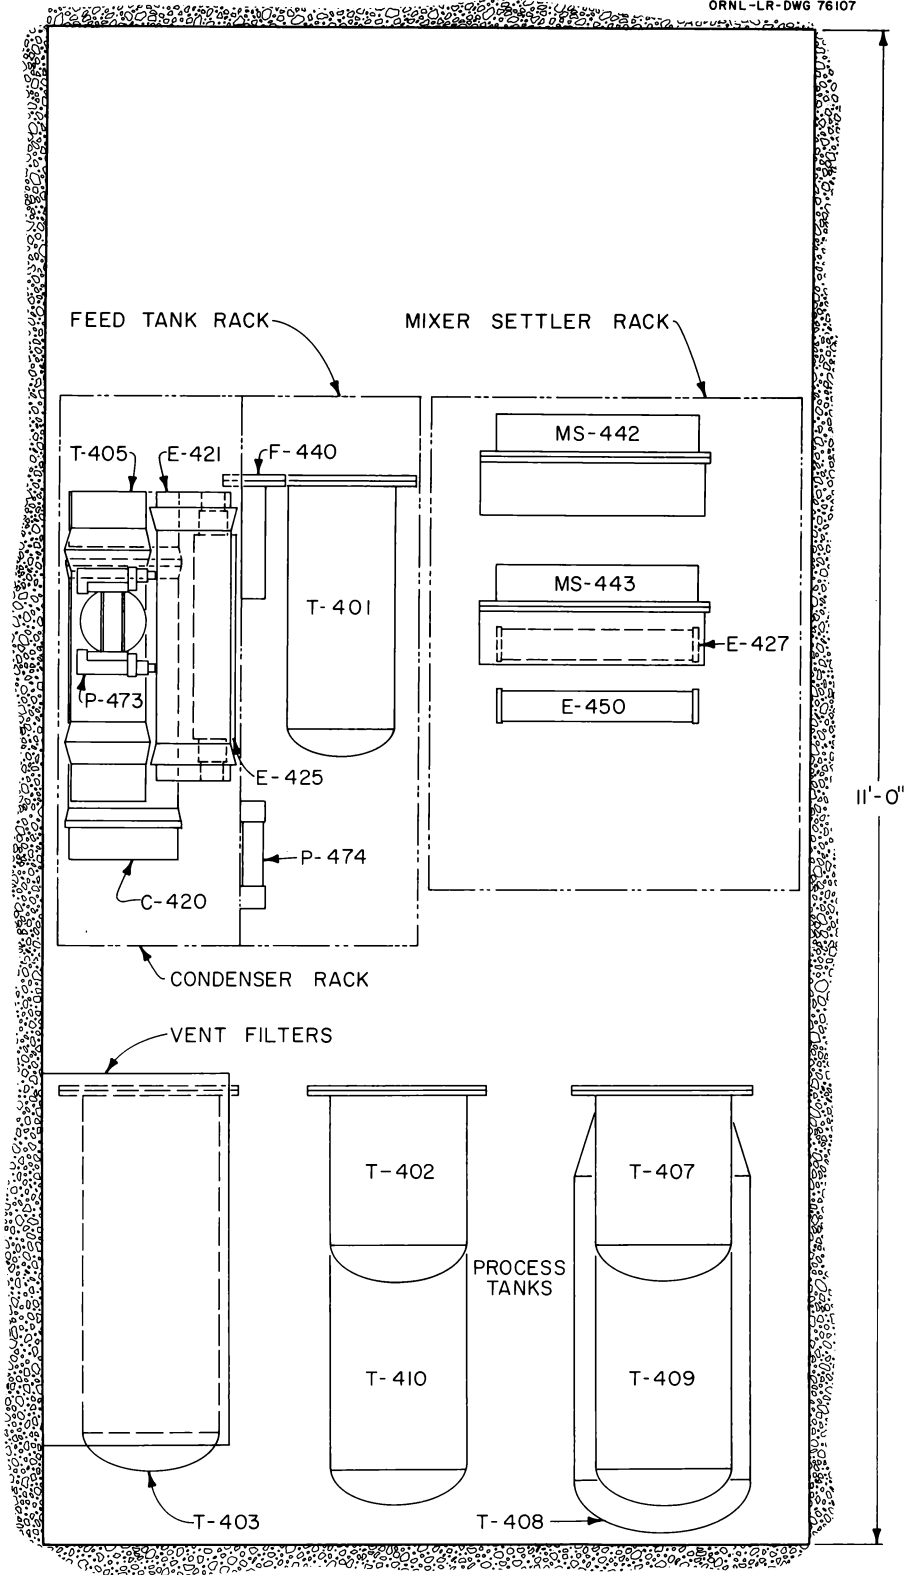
Arrangement of Equipment in Cell 4, Elevation.
